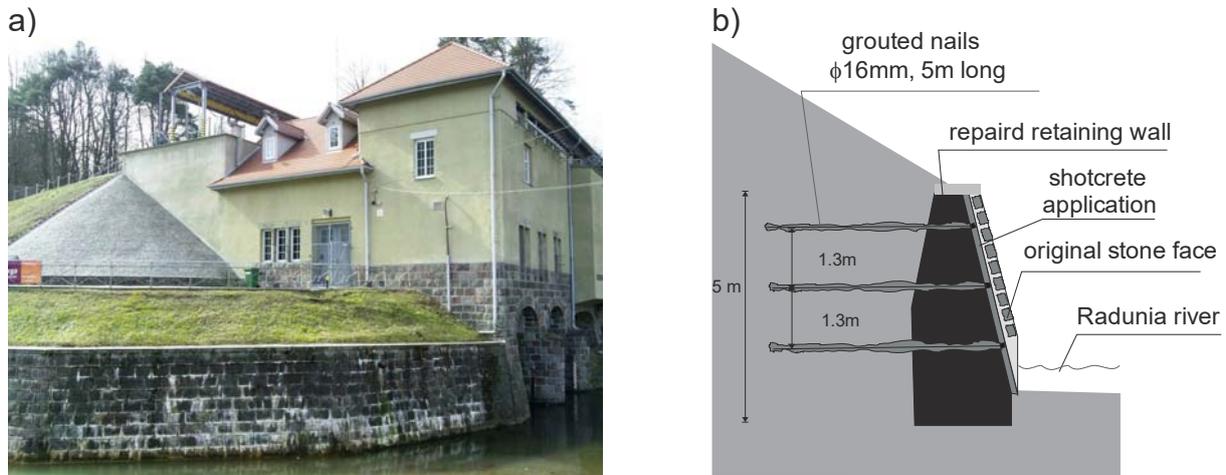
Hydroelectric power plant in Rutki: a) retaining wall supporting the dam and the power plant building, b) stabilisation of old gravity wall using soil nailing
